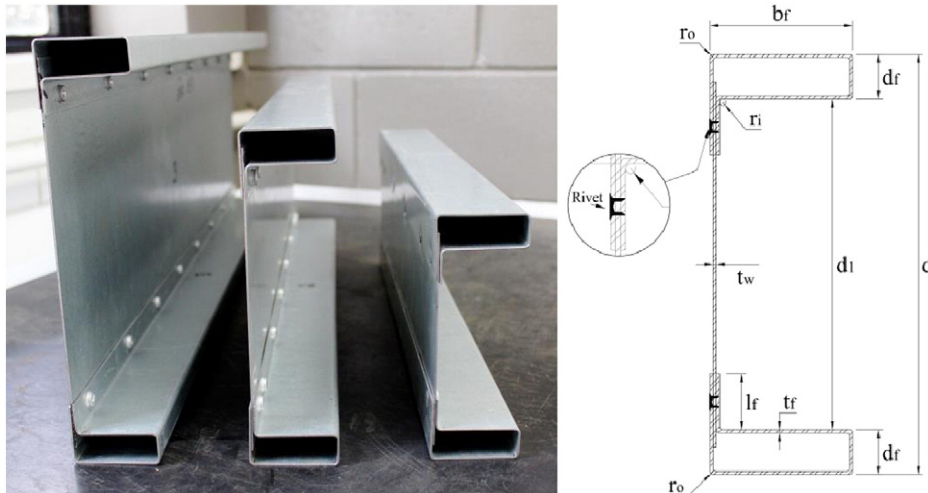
Rivet fastened rectangular hollow flange channel beam (RHFCB).
